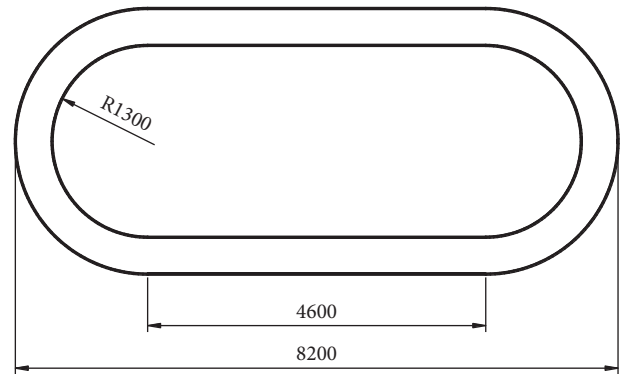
Pier cross-sectional diagram (unit: mm).
